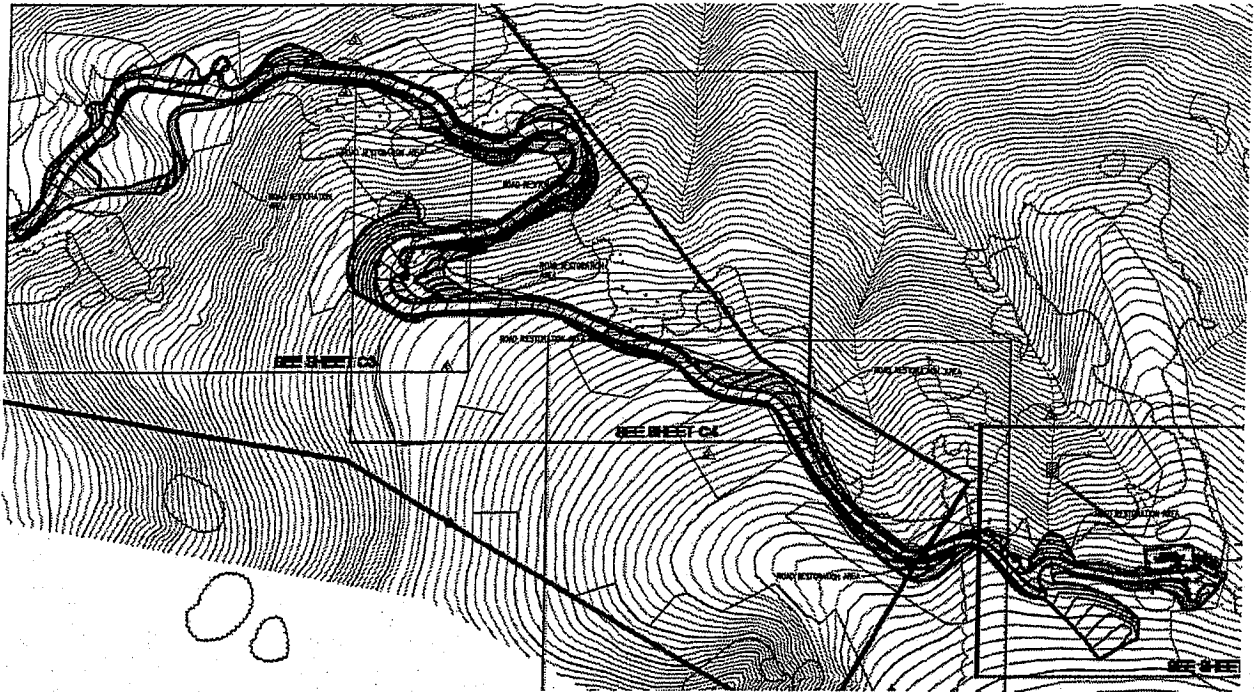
Proposed Road Alignment Improvements (PLN070482)
